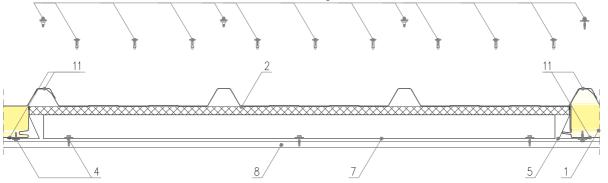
IzoRoof PIR/PIR+; MWF; EPS - strip skylight
